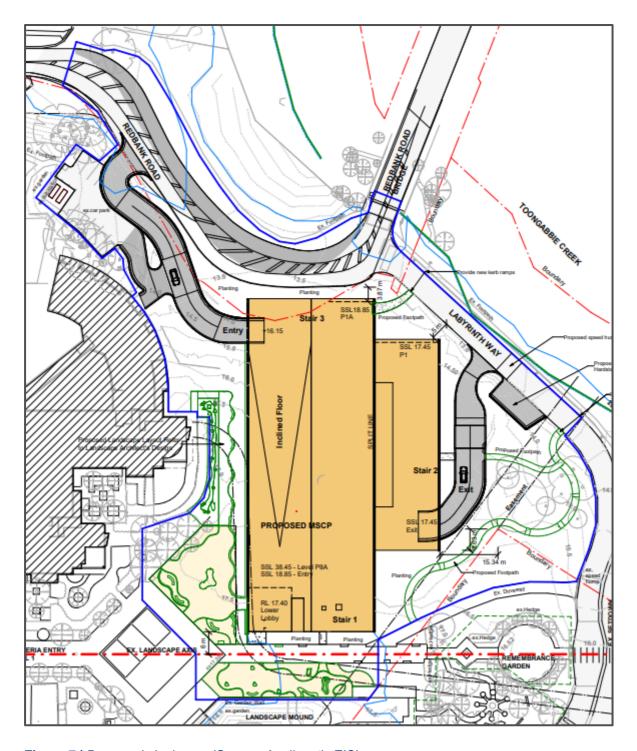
| Proposed site layout (Source: Applicant's EIS)
